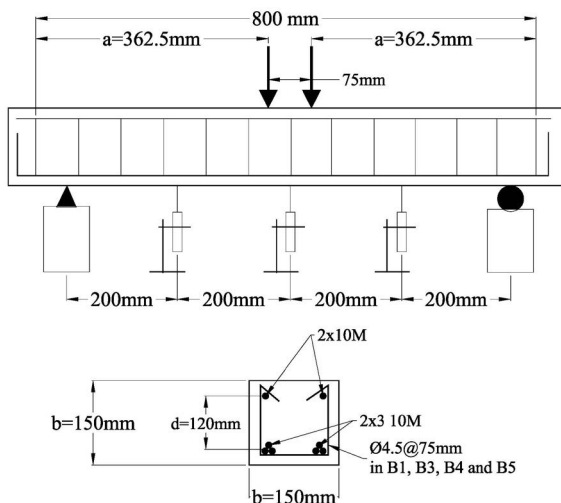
Beams set up, geometry and reinforced details of beams performed by Majdzadeh *et al* [10].
